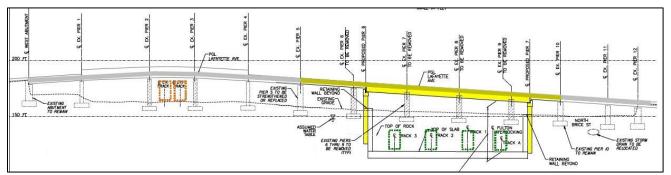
The proposed new alignment under the bridge carrying West Lafayette Avenue over the rail line.
